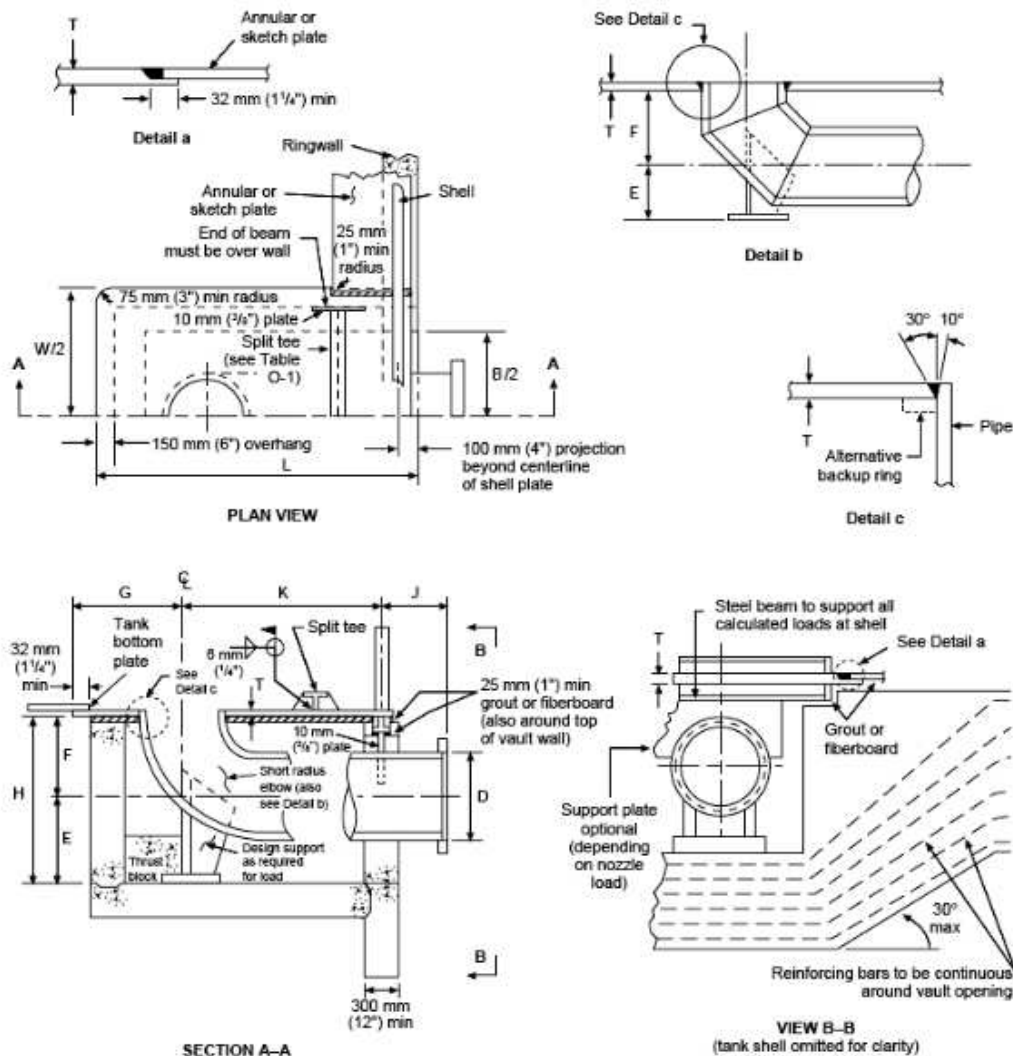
Example of Under-Bottom Connection With Concrete Ringwall Foundation
